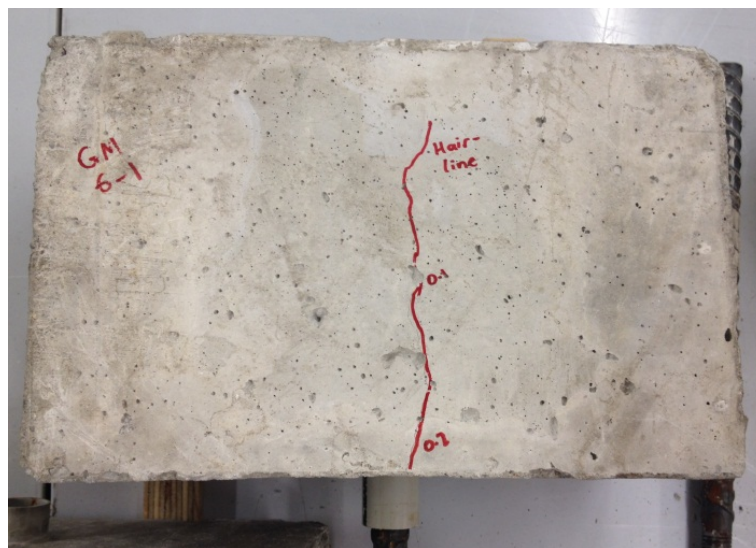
Photo showing typical specimen damage of a narrow flexural crack where crack width did not exceed 0.2 mm under the maximum applied pull-out force.
